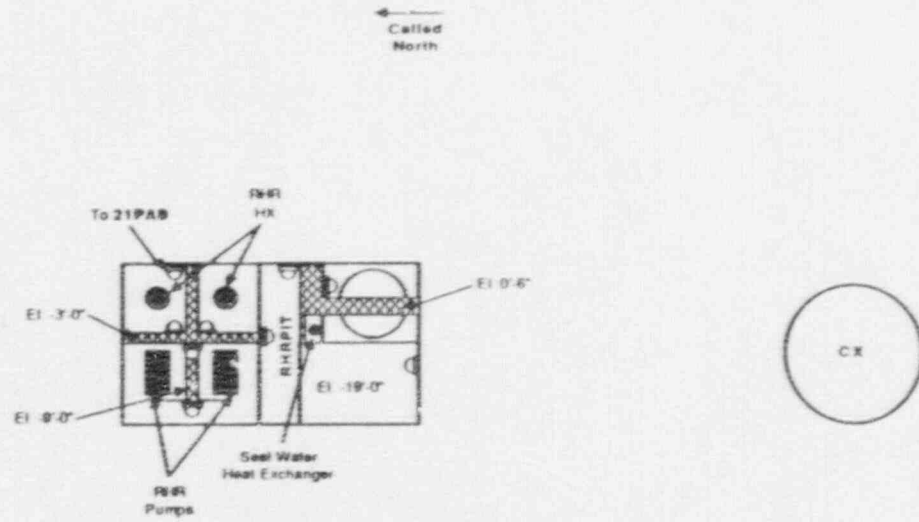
Haddam Neck RHR Pit, Elevation -19'-0"
